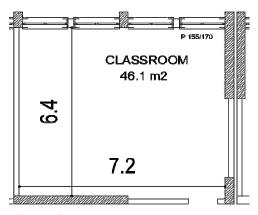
Floor plan of typical classrooms for Schools S5 & S6.
